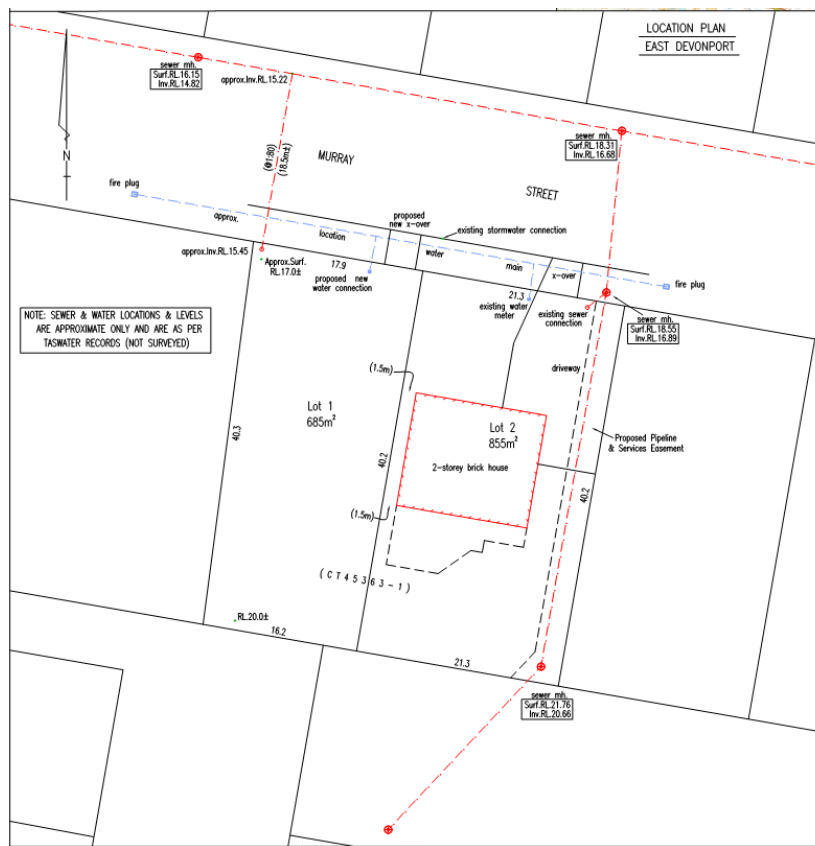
Proposed subdivision plan – Michell Hodgetts
